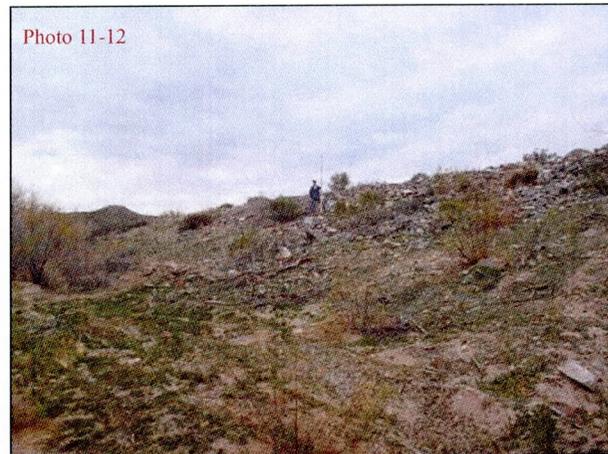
Left-bank levee just downstream of Estrella Parkway Bridge, looking upstream
